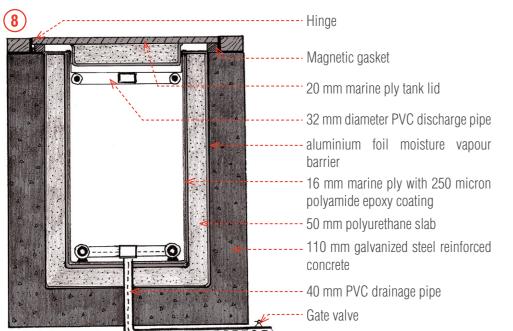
Typical insulated fish and ice concrete storage tank
